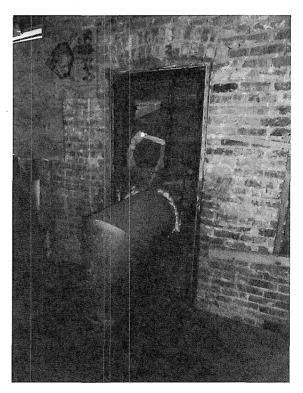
Detail view of punched window (original door) opening with ventilation duct. Note deteriorated wood frame (photograph taken on 02/27/2018).
